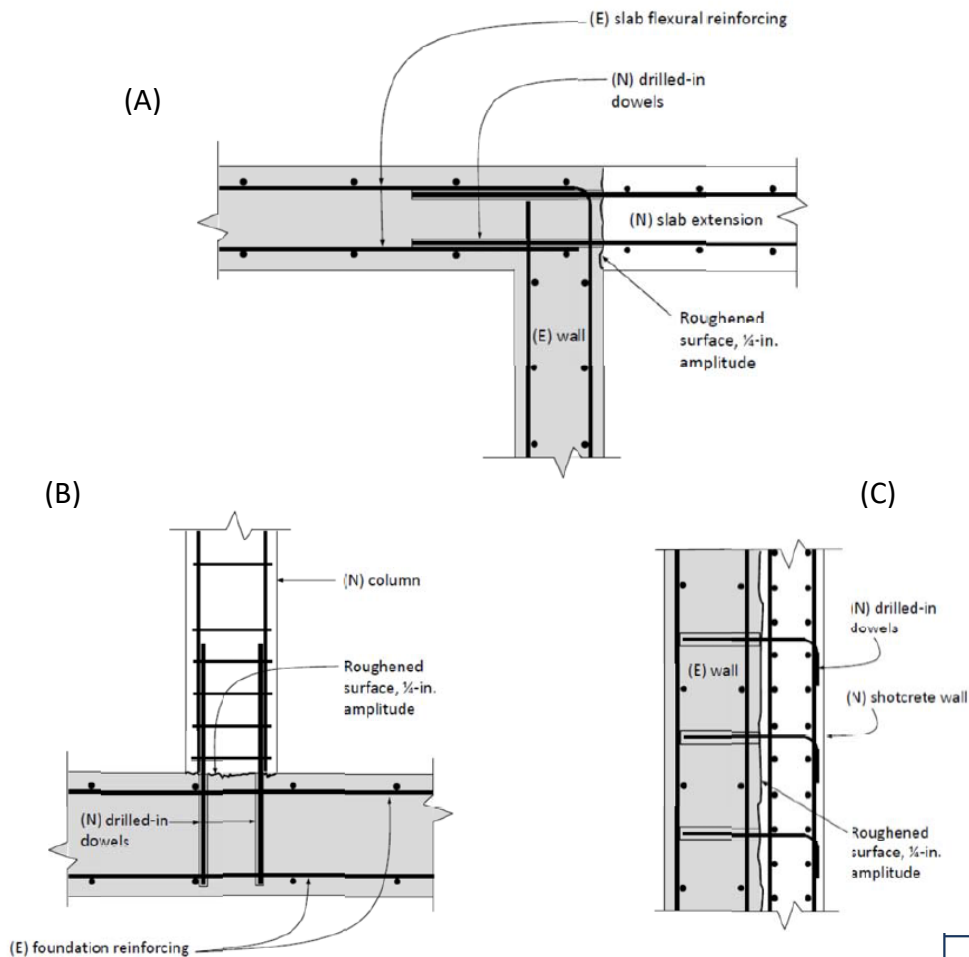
APPLICATION EXAMPLES FOR POST-INSTALLED REINFORCING BARS:
